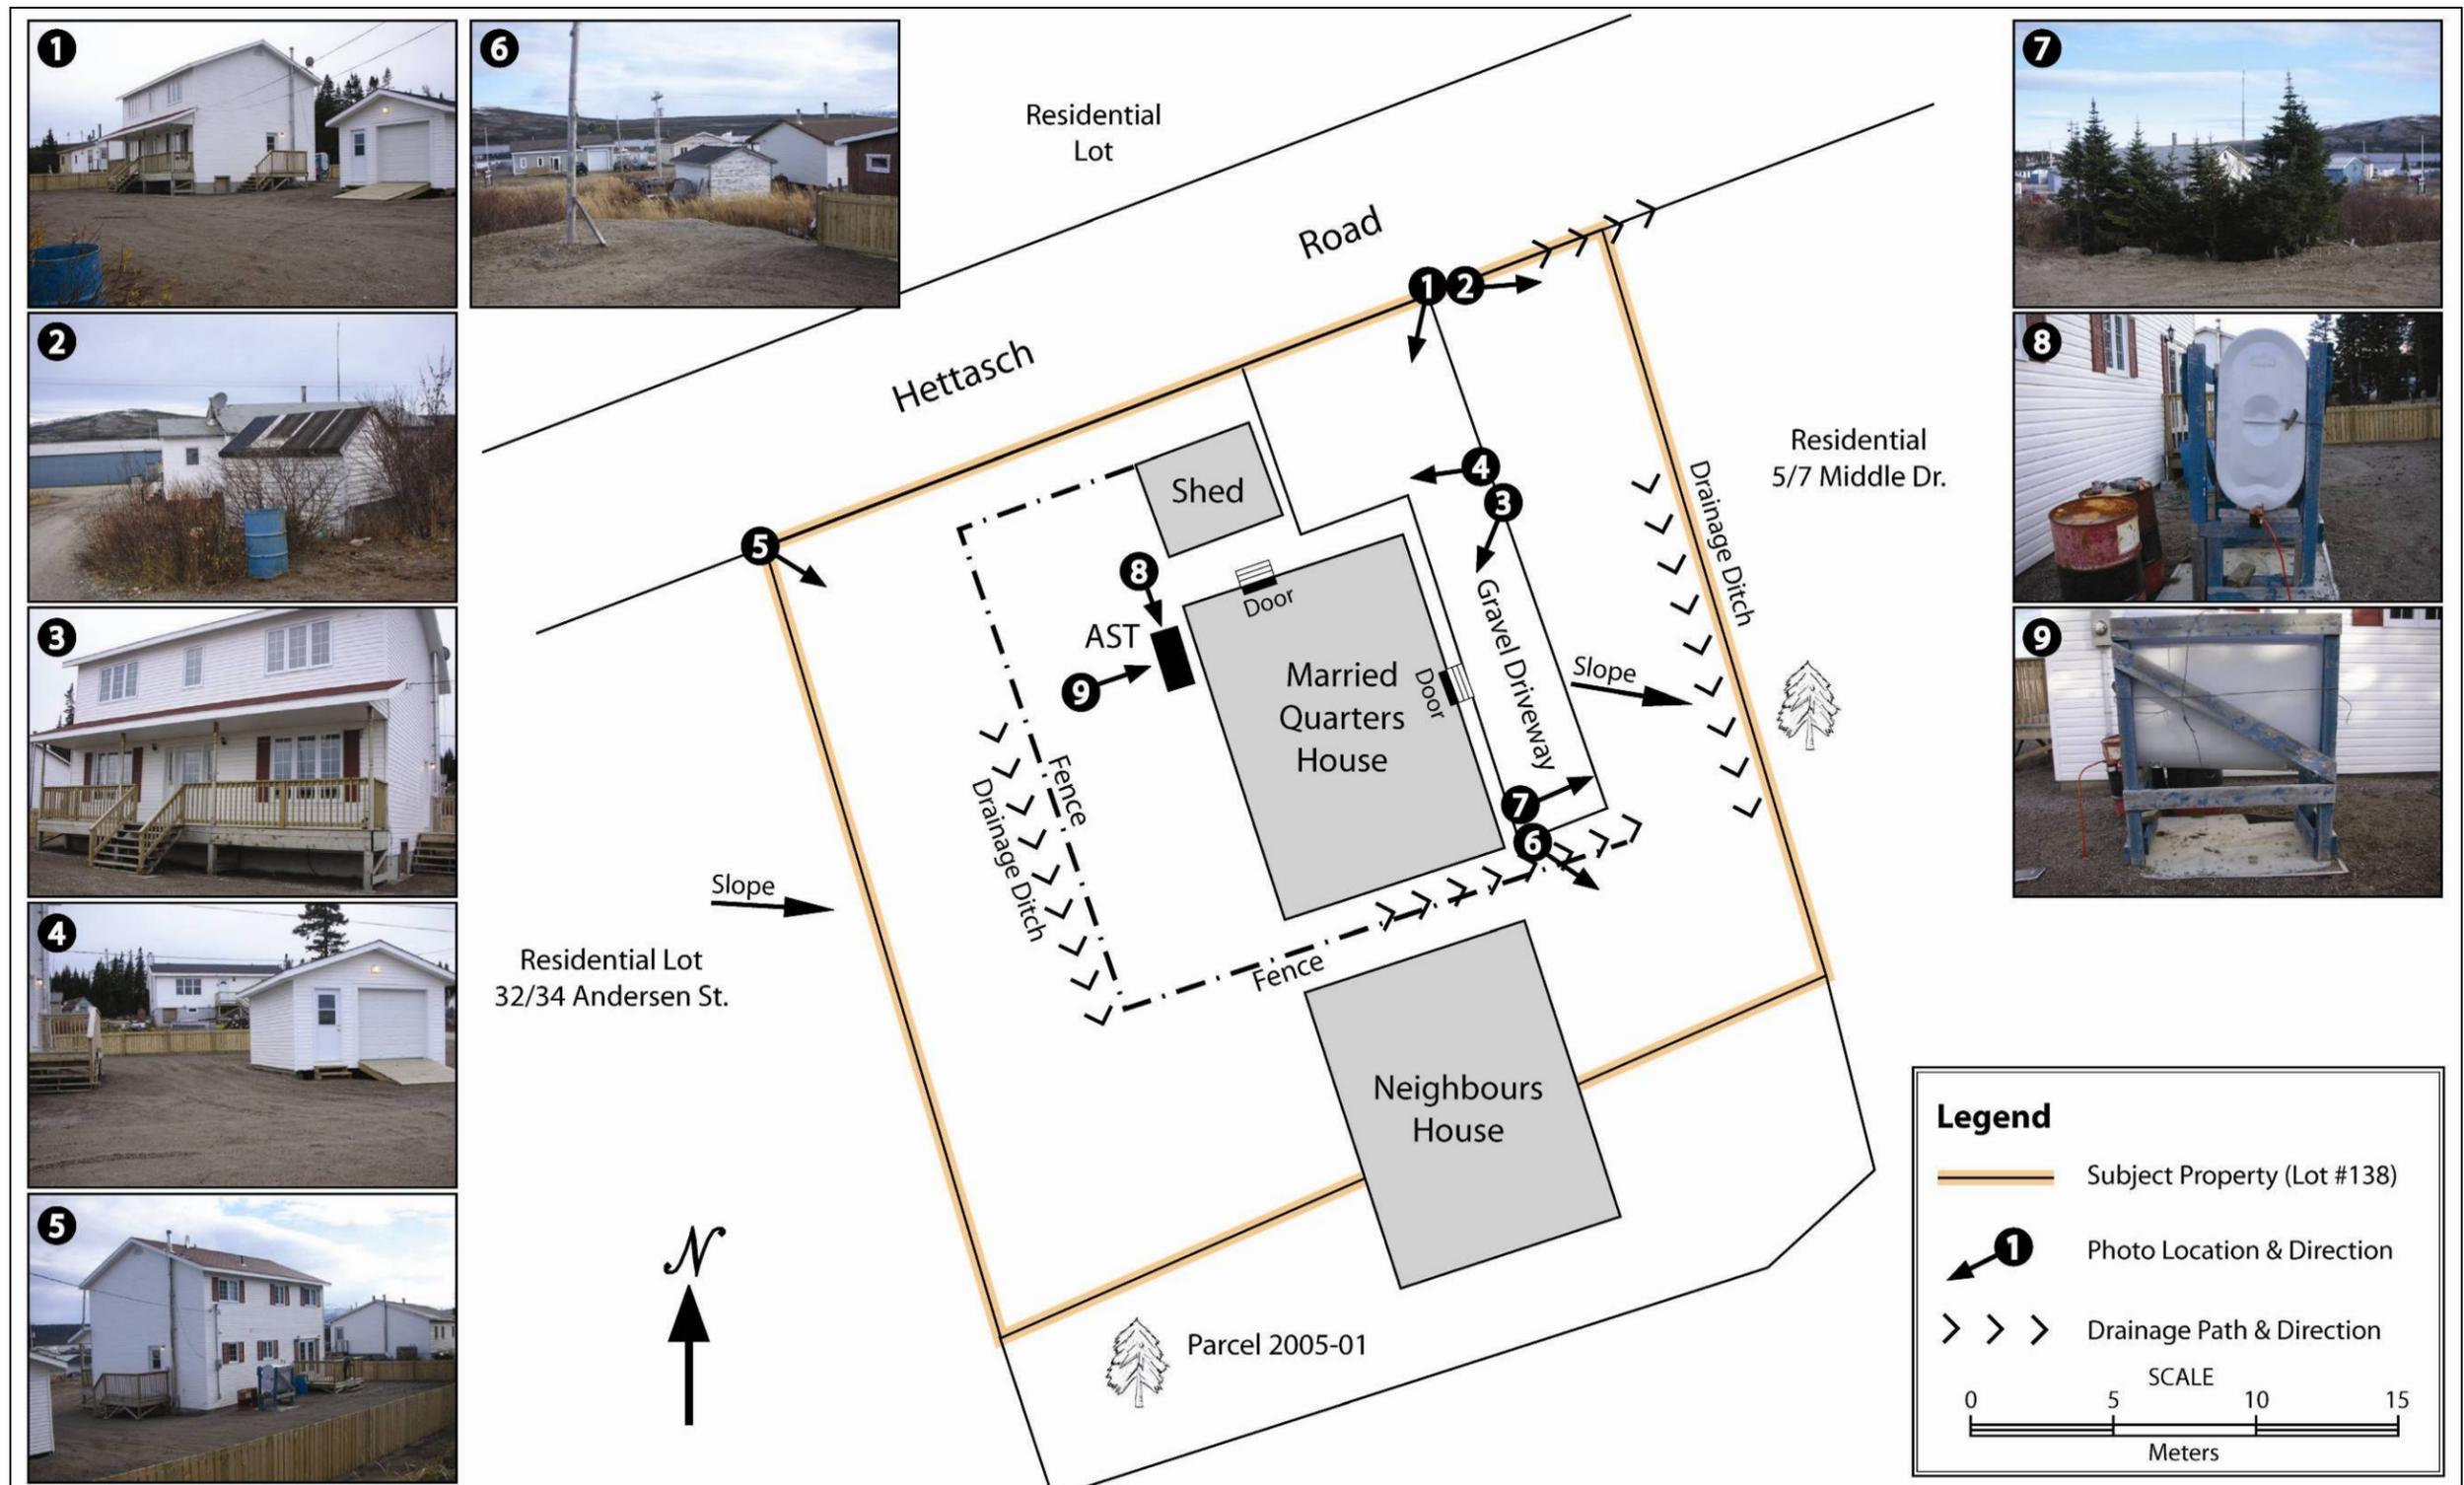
Married Quarters – 5/7 Hettasch Rd. (Lot #138) Site Plan with Photographs
